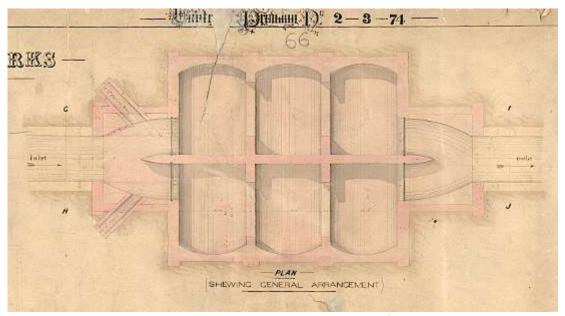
Section through the silt pit proposed at the junction of Lackey Street and Pier Street in 1874 (OCP 66 Dwg No 2-3-74, 1874, Sydney Water).
